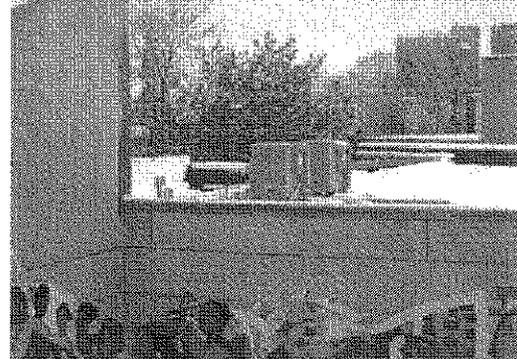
Remaining two condensers over auditorium (Section 7.1)
